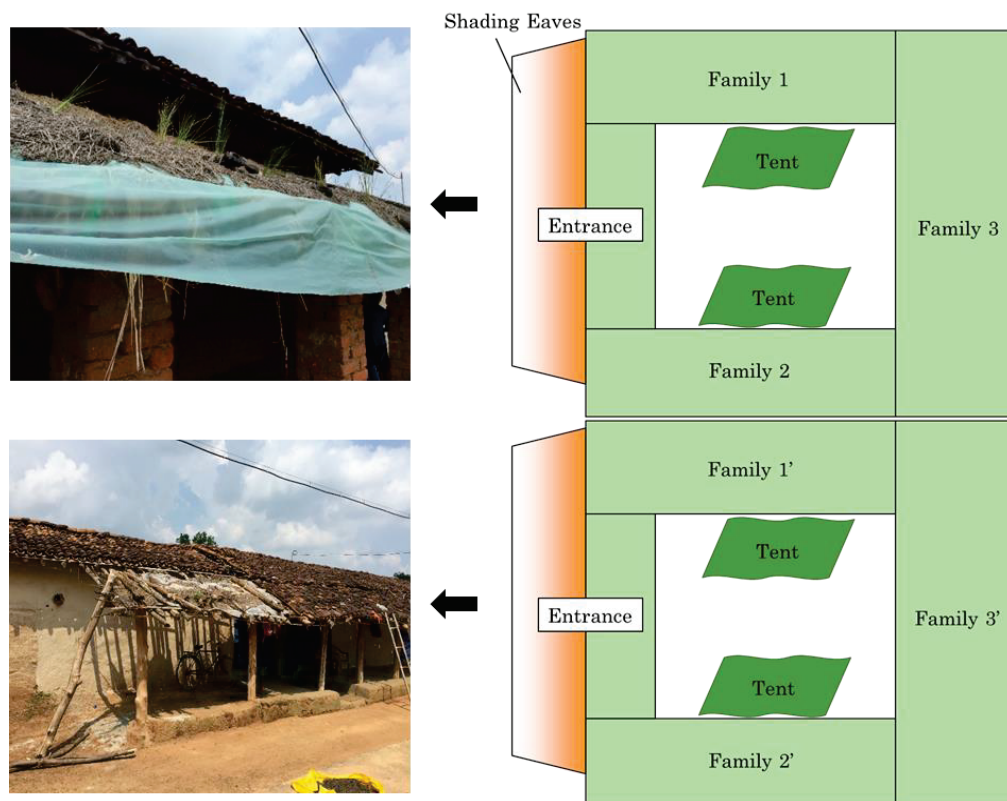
Shading eaves in the village (left) and schematic structure of neighboring houses (right).
